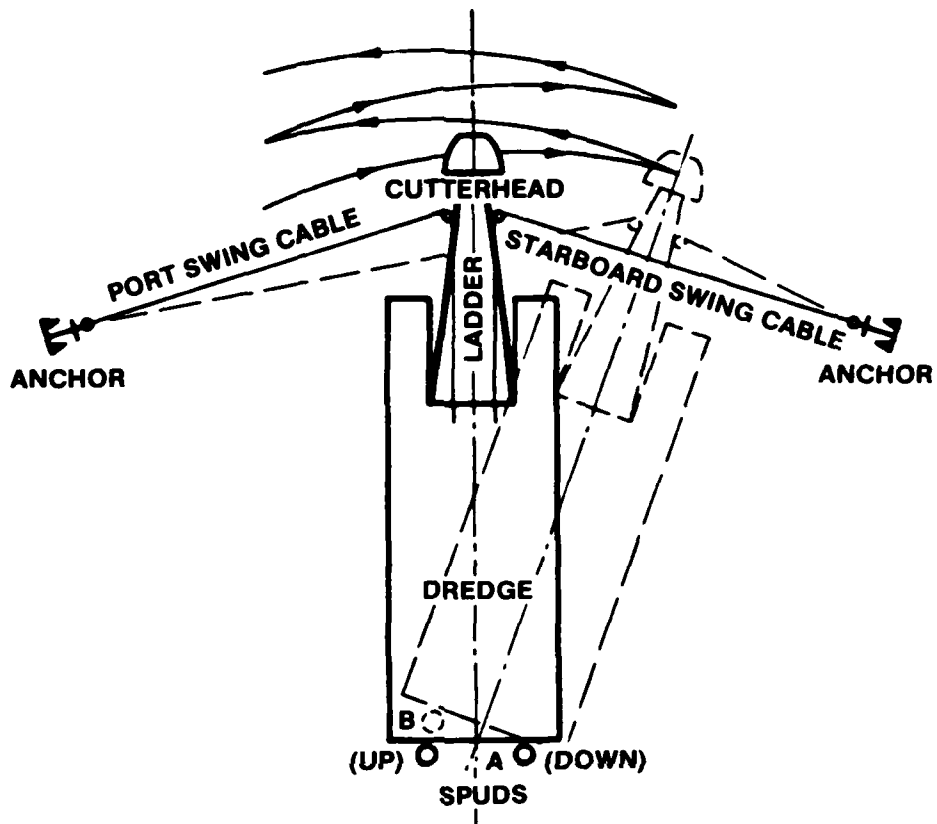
Operation of Cutterhead Dredge — Plan View
